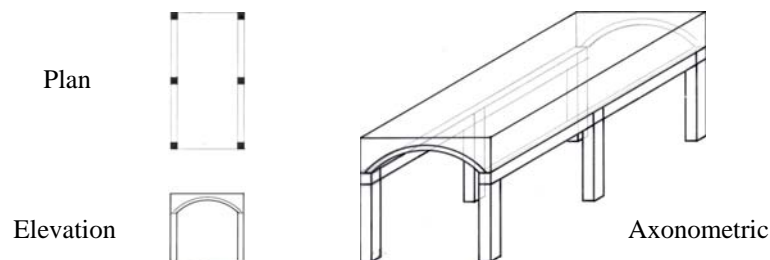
Barrel Vault Plan, Elevation, and Axonometric Drawings. The barrel vault is a simple, but very strong structural element.
